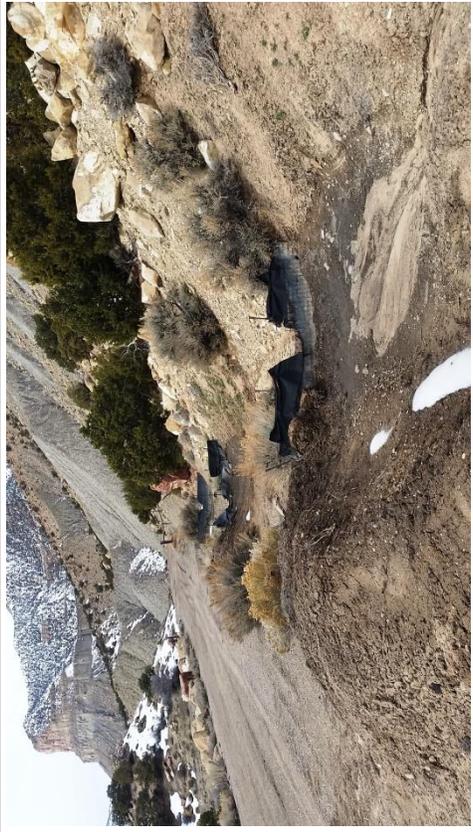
DIVERSION DITCH, WASTE ROCK SITE
